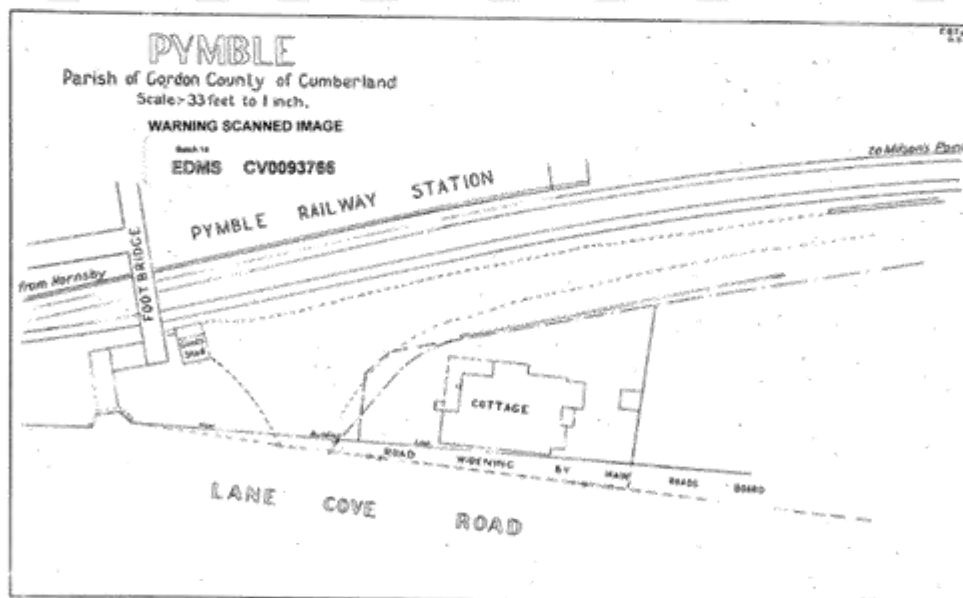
Plan of Pymble showing Pymble Station, including footbridge, siding and goods shed, and the widening of Lane Cove Road, undated
